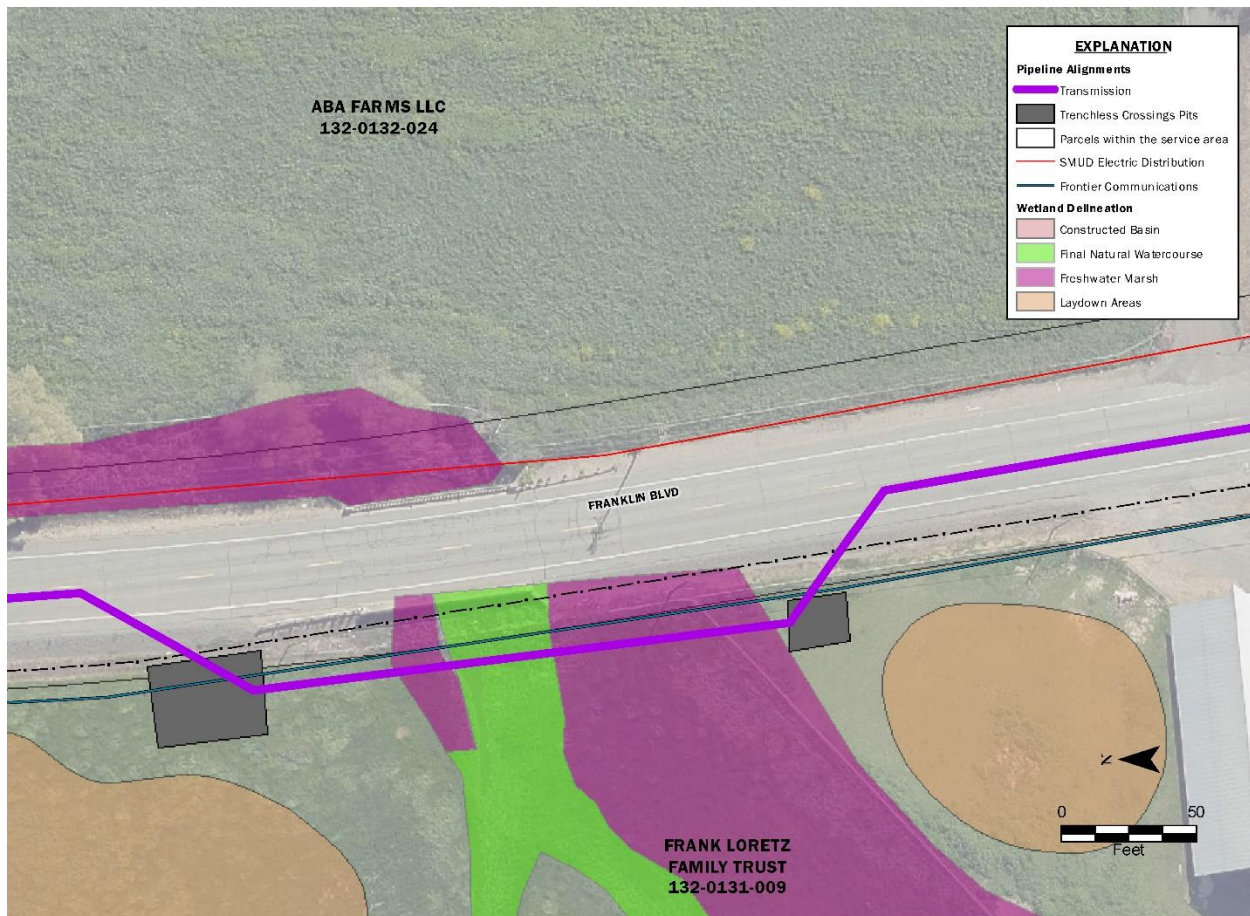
Proposed Trenchless Crossing of the North Fork of Stone Lake Creek at Franklin Boulevard
